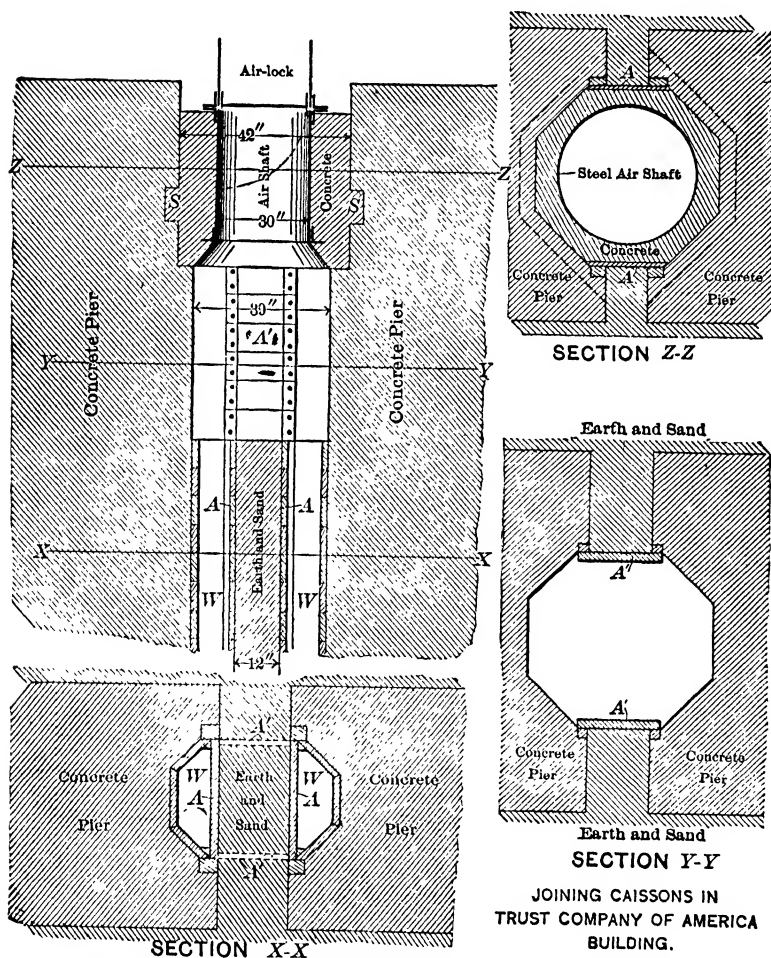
Method of Sinking Joint Well between Caissons.
